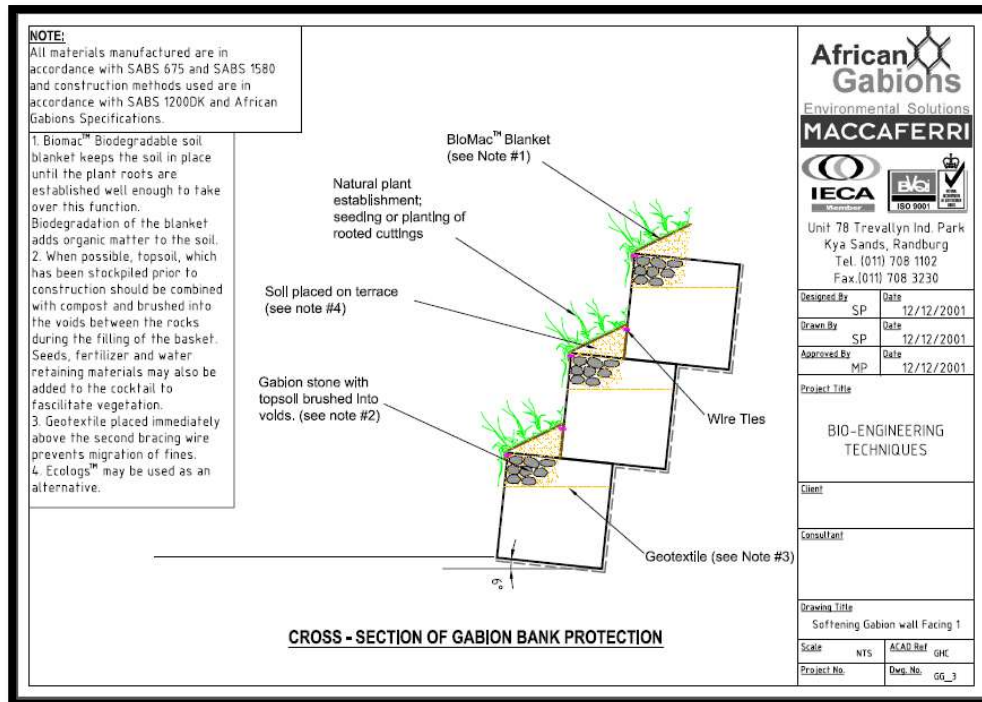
Typical gabions structures for river bank stabilisation/protection (riverbank)
